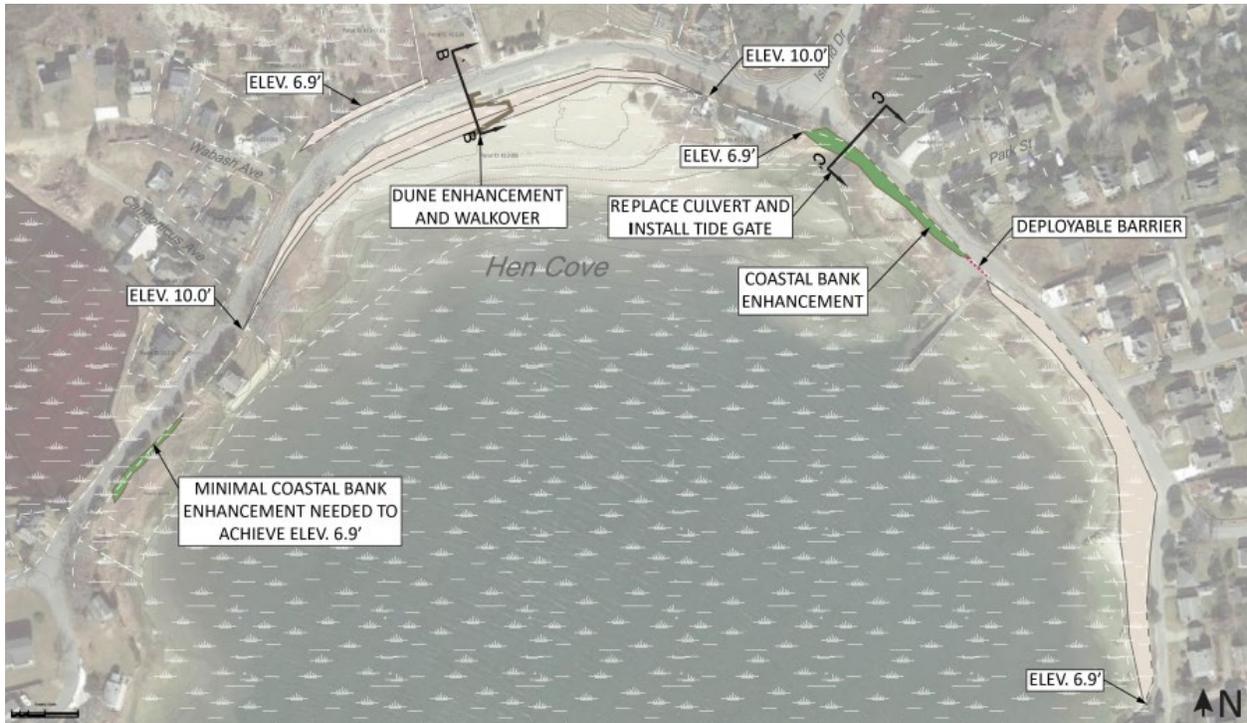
Circuit Avenue Alternative 3 - Green
